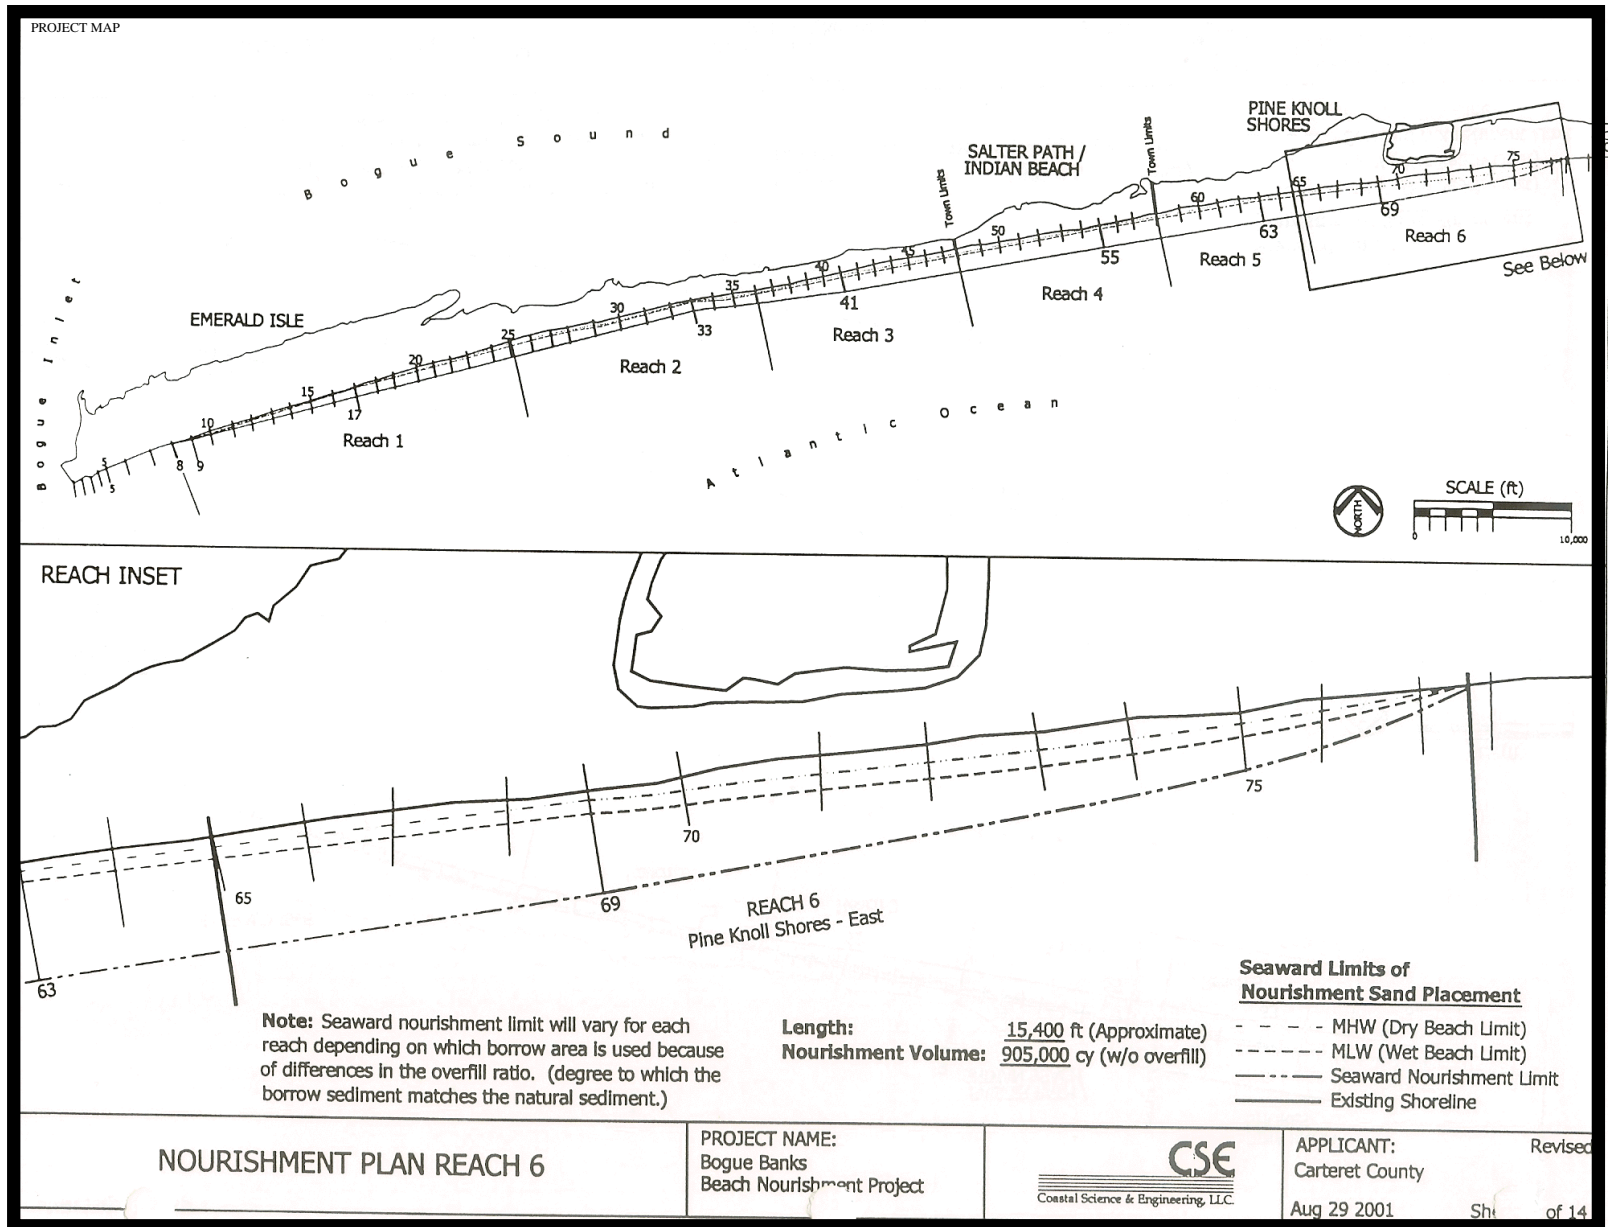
Plan view of Pine Knoll Shores beach fill project (Reach 6).
